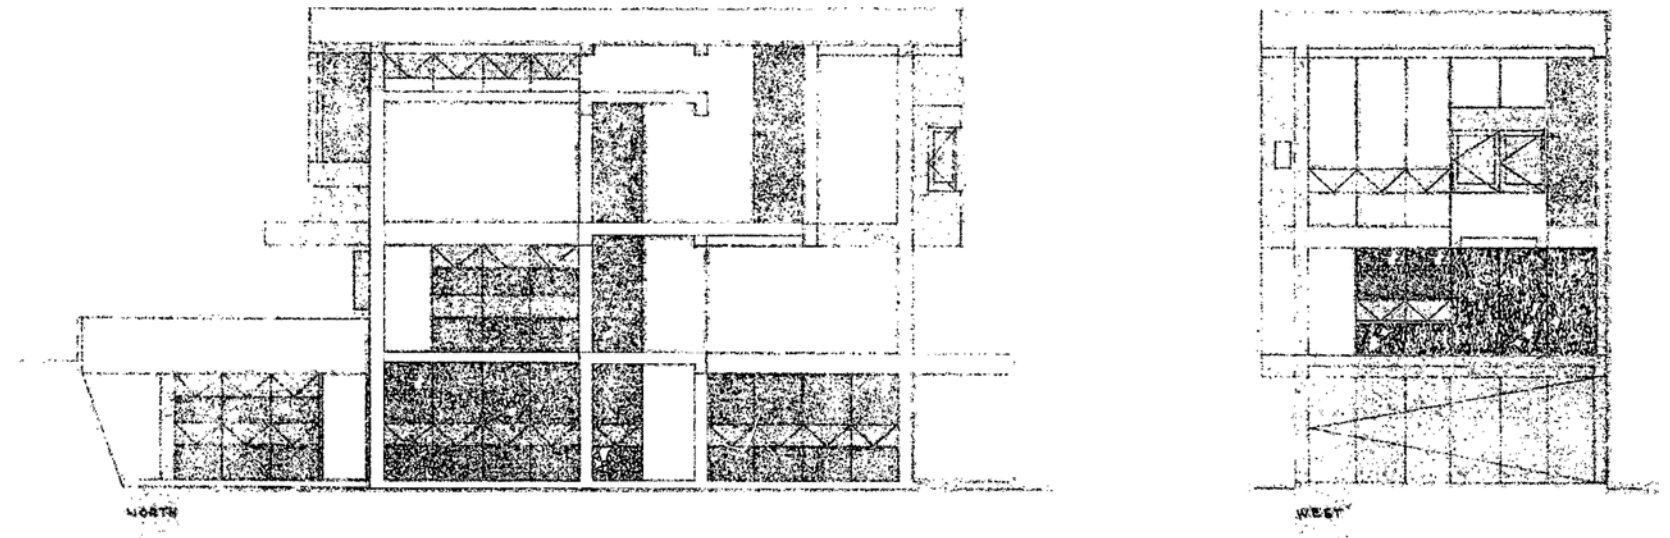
1962 North and west elevations from drainage plans (Camden Local Studies and Archive).
